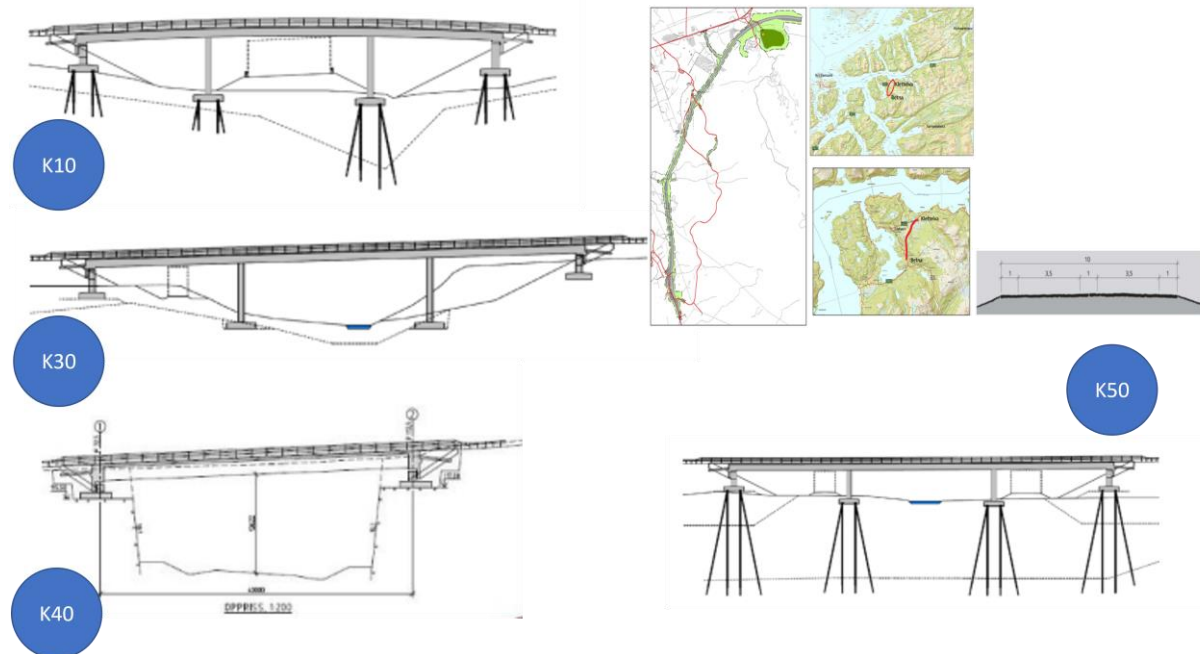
shows all bridges in the parcel Betna-Klettelva with zoning plan and road section H4
